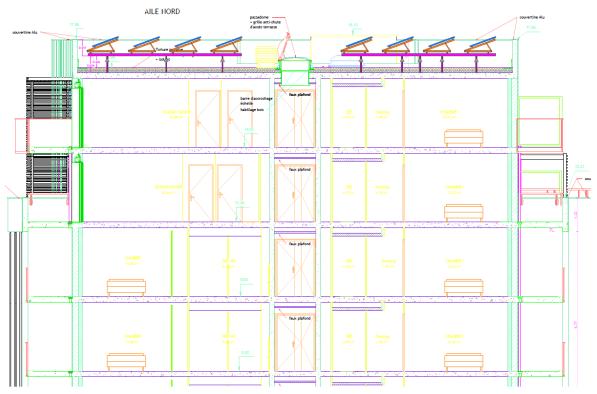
Sectional view of the North wing of the building with PVT implementation
